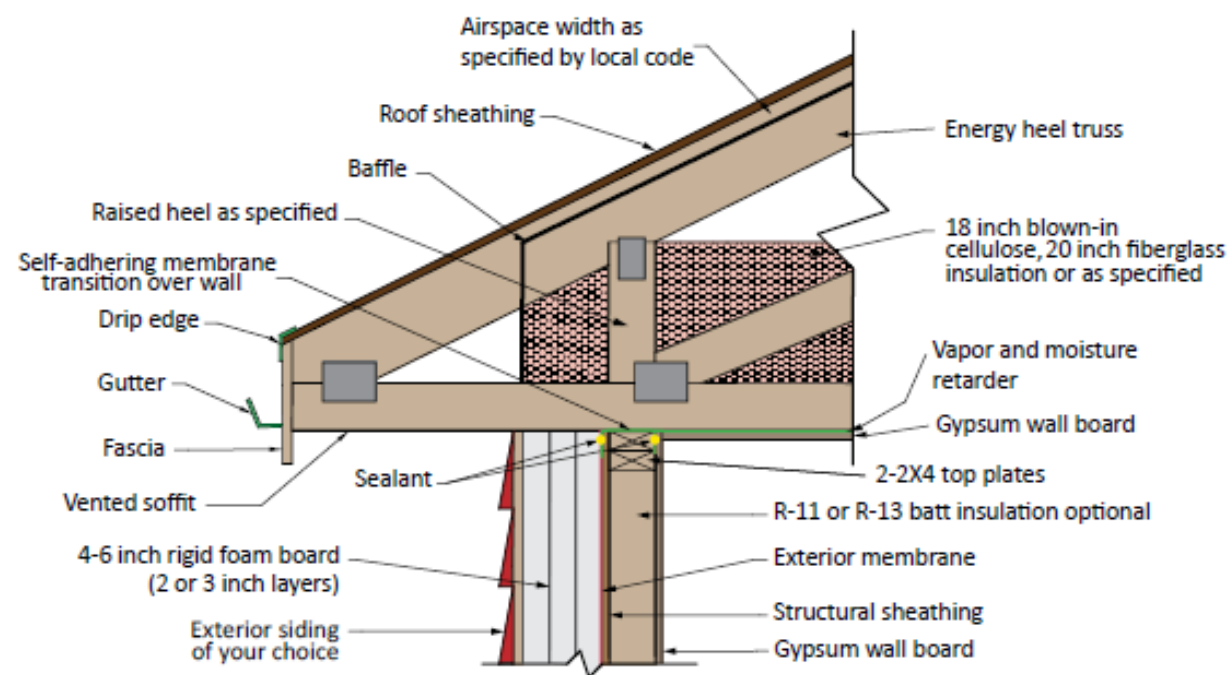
Installation of continuous exterior insulation as part of the REMOTE Wall (CCHRC 2009)
